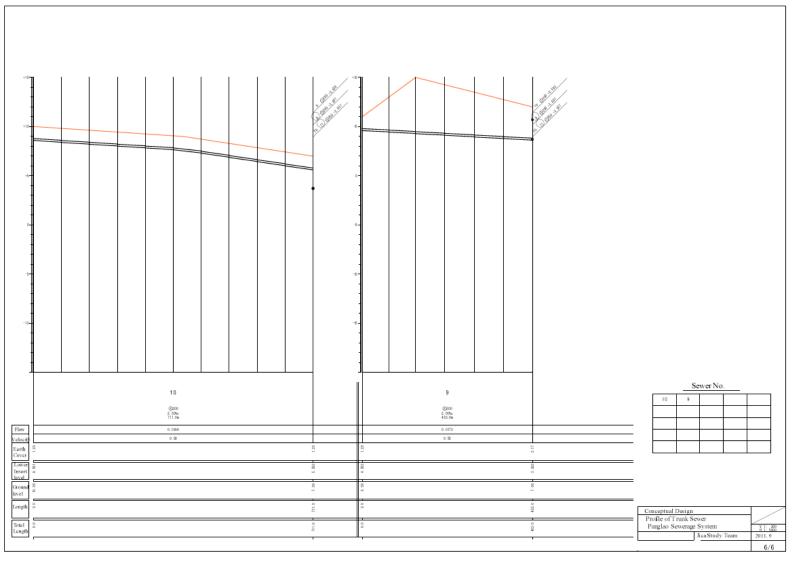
Profile of Trunk Sewer (Panglao Sewerage System)
